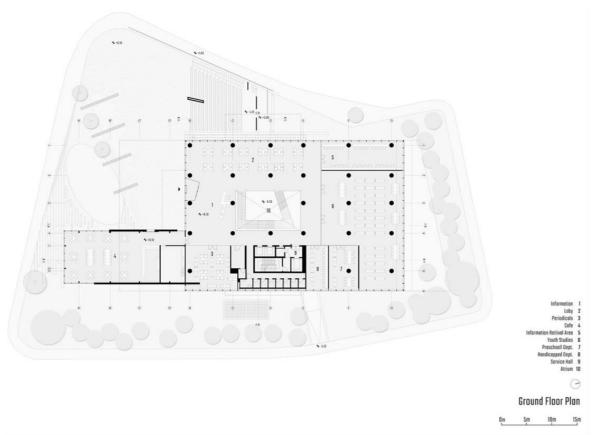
Merkezefendi Library Ground Floor Plan (Çetin, 2024).
